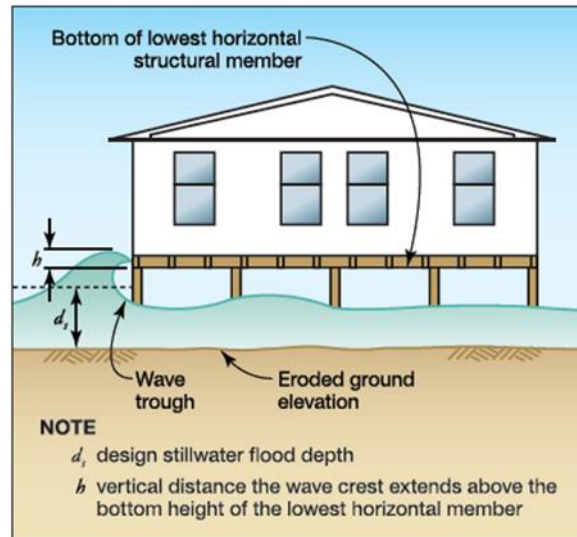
Wave slam due to wave crest hitting side wall of elevated building (source: FEMA, 2011)
